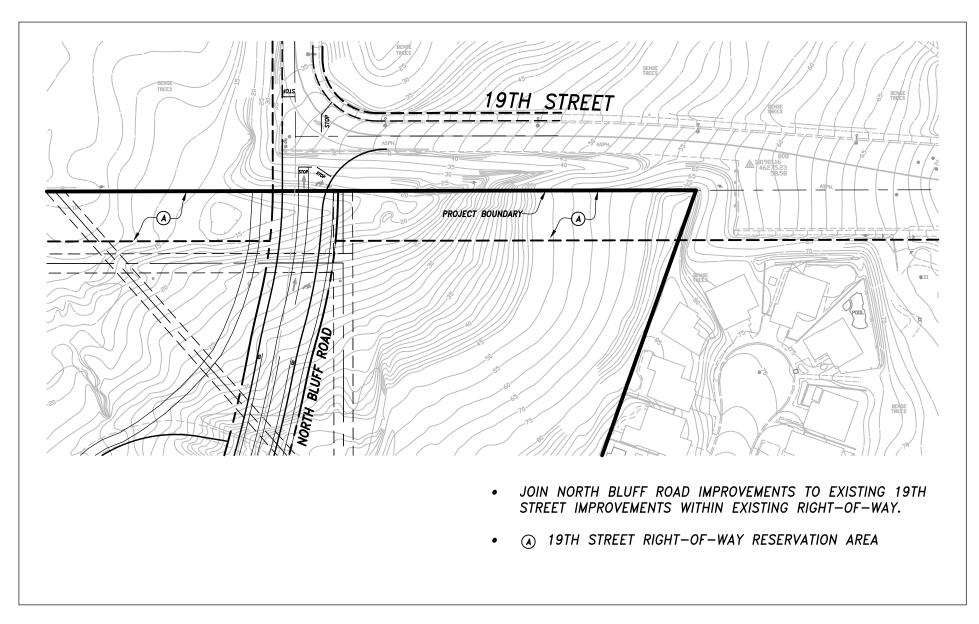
19th Street and North Bluff Road Entry and Off-Site Improvements
